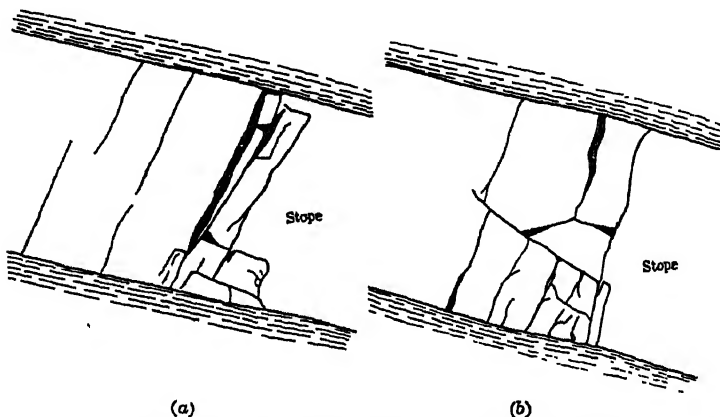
(a) PILLAR FAILING UNDER DISTORTION OF ORE AND HEAVE OF BOTTOM ROCK.
